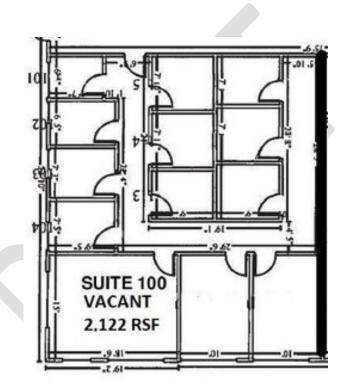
FLOOR PLAN OF LEASED PREMISES
